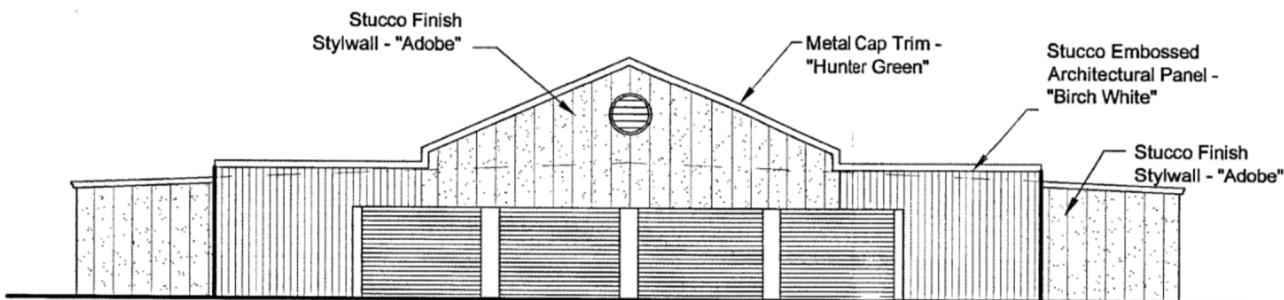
West façade of main building (elevations from Appl. #2005-063).
